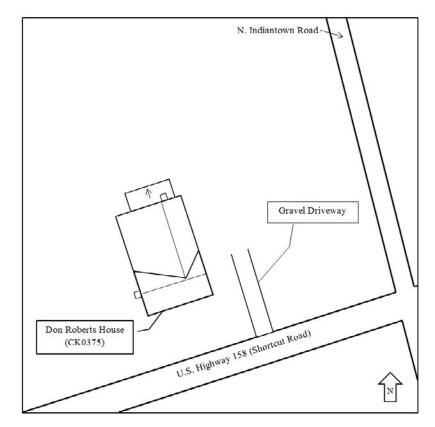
Site Plan of the Don Roberts House, Not Drawn to Scale.
